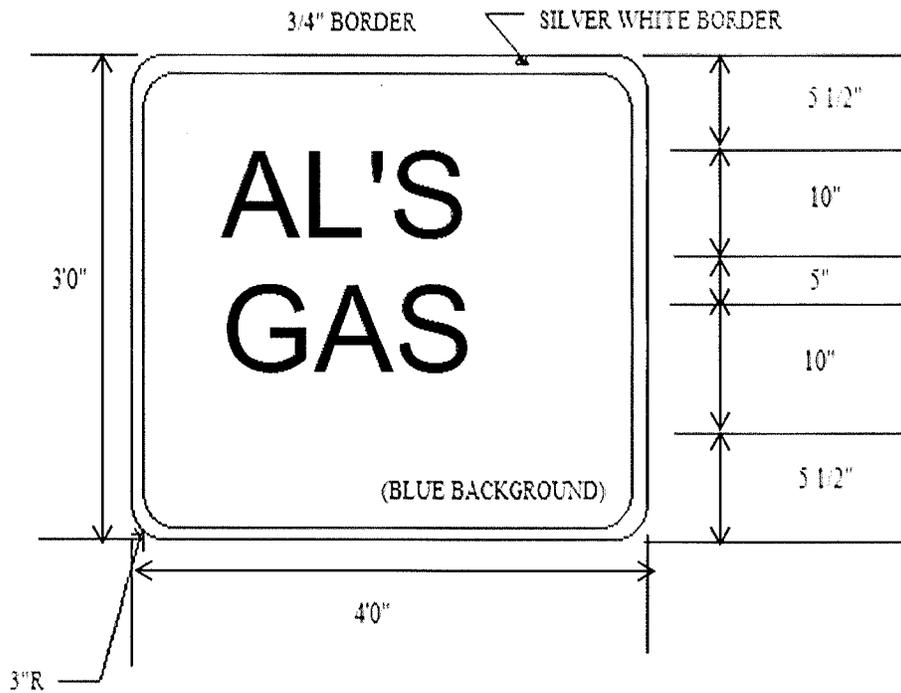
TYPICAL MAINLINE LOGO SIGN DETAIL
